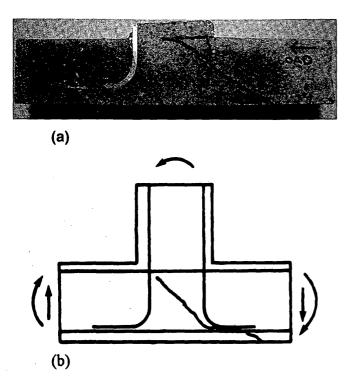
Cracking patterns in (a) small-scale column and footing joint and (b) column and beam joint.
